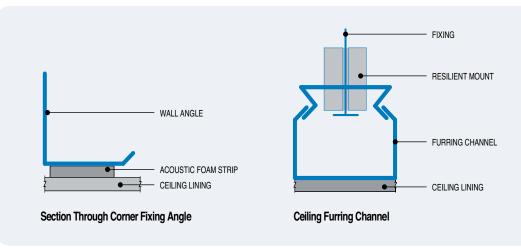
Resilient mounted ceiling lining. Resilient mount and furring channel detail
